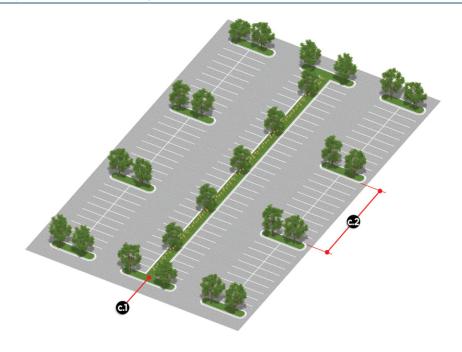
Parking Lot Perimeter Area Landscape Standards
